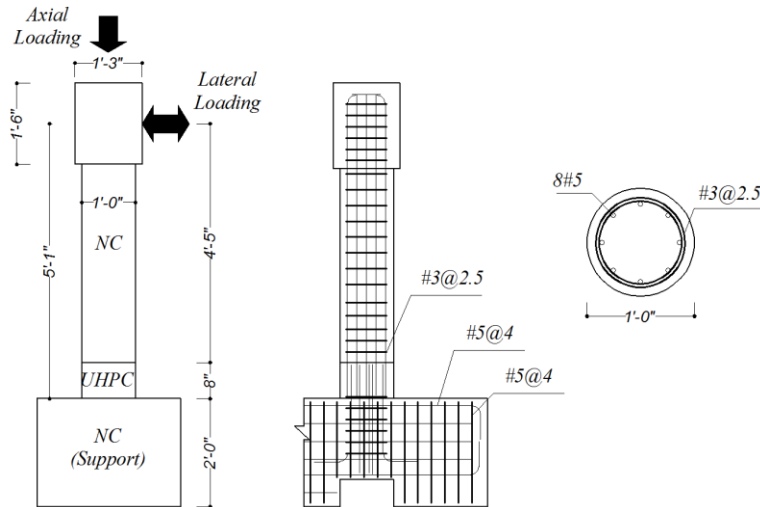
Specimen NS-2.5-10 dimensions and reinforcement details (No stirrups at splice region).
